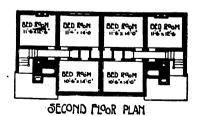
HOUSES SOLD UNDER PLAN NO. 3.
